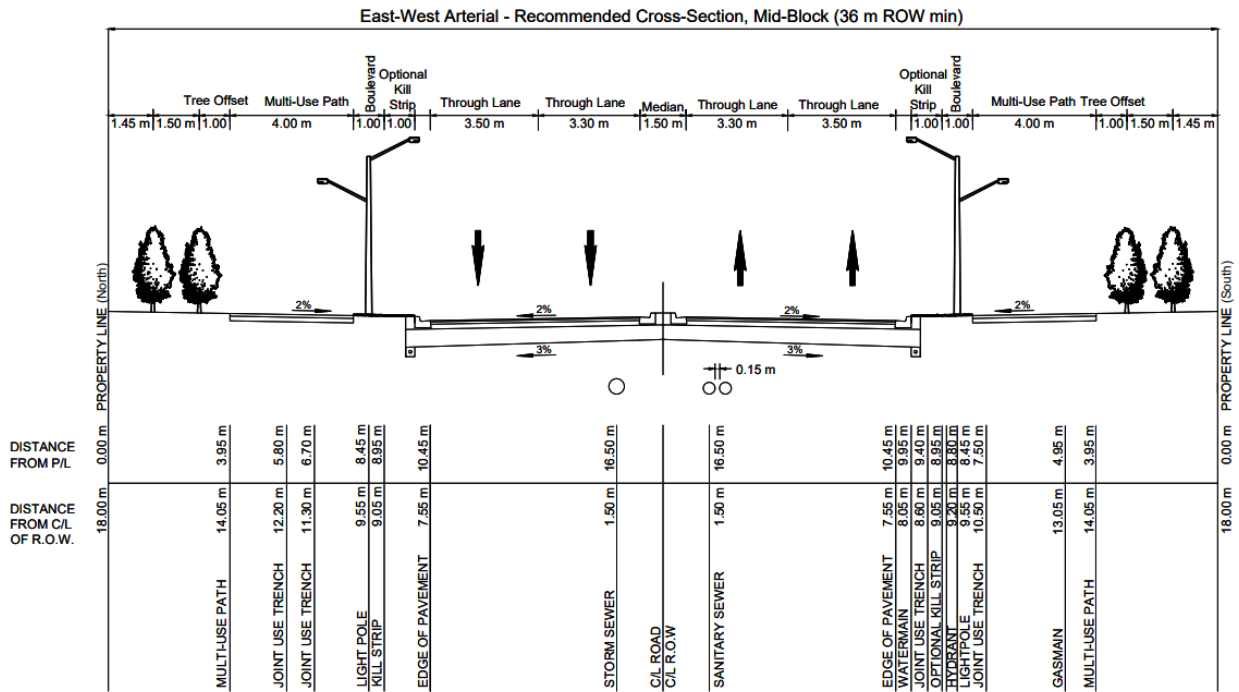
Recommended Cross-Section for the East-West Arterial
